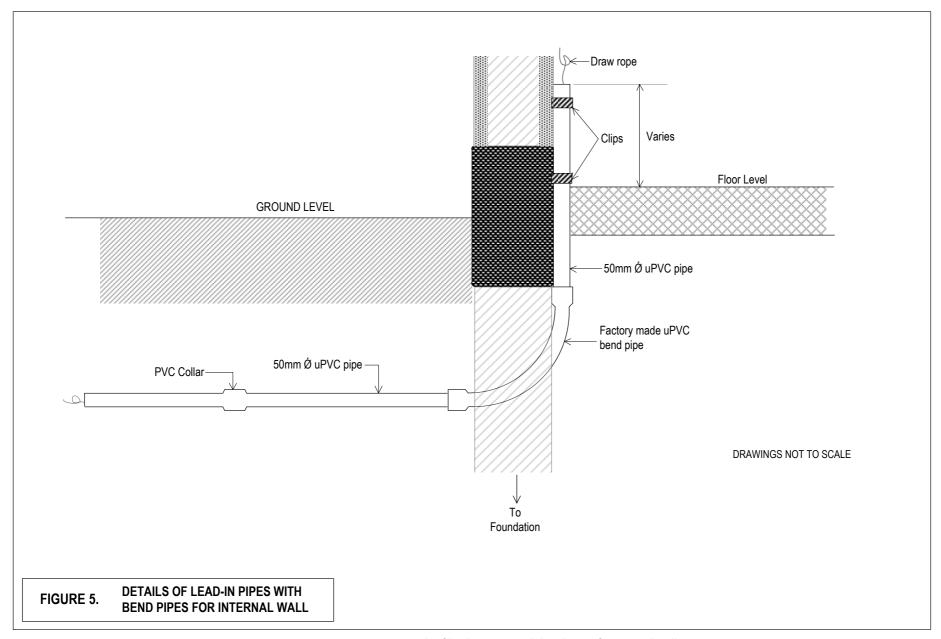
Details of lead-in pipes with bend pipes for internal wall
